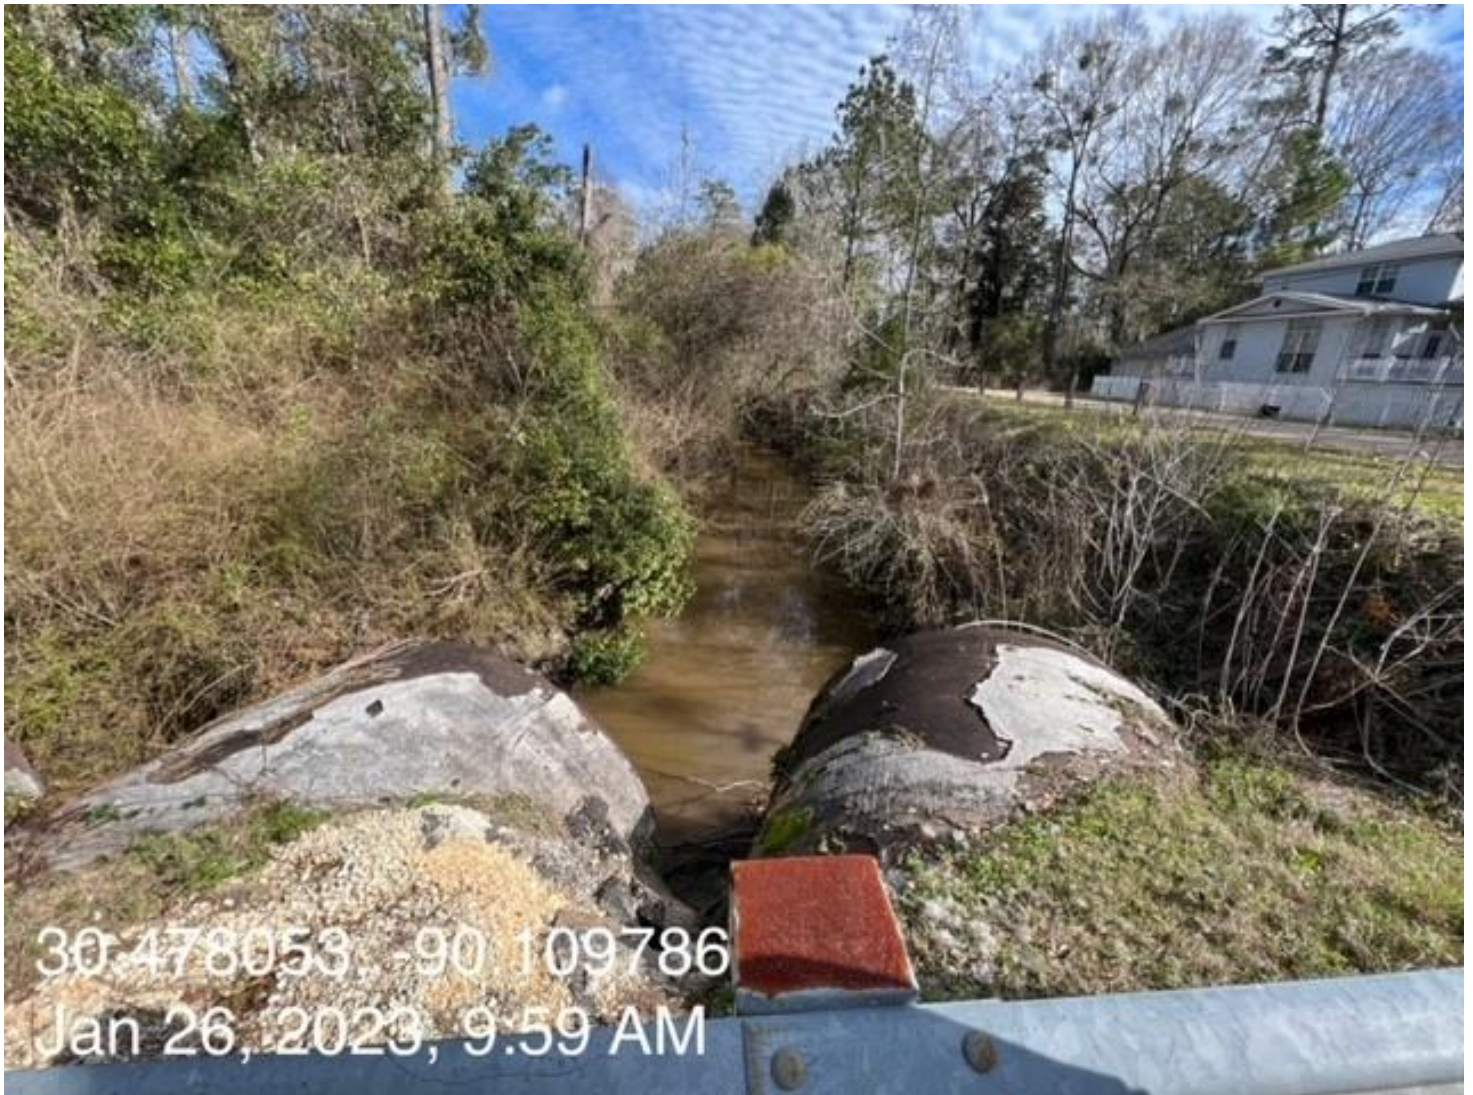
Facing North. Photo taken from South and West Slidell ROW.
